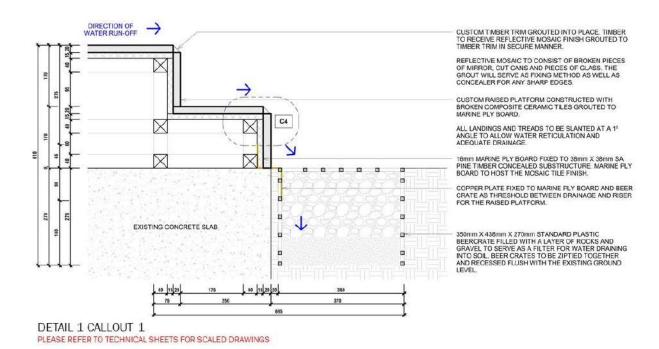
Detail 1 technical drawings as specified (Author, 2021).
